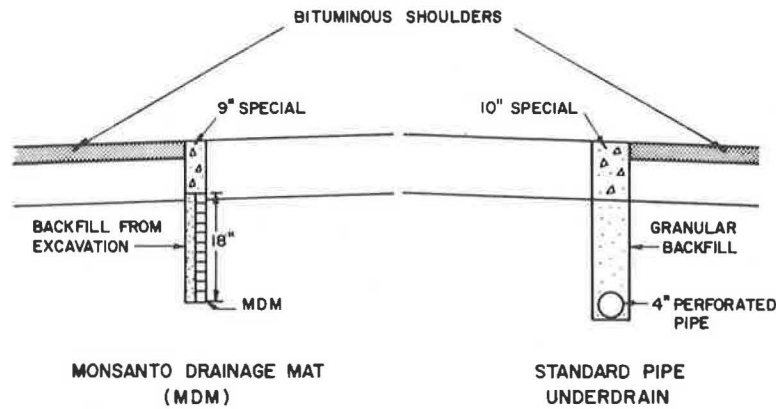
Details of Monsanto drainage mat and standard pipe underdrains.
